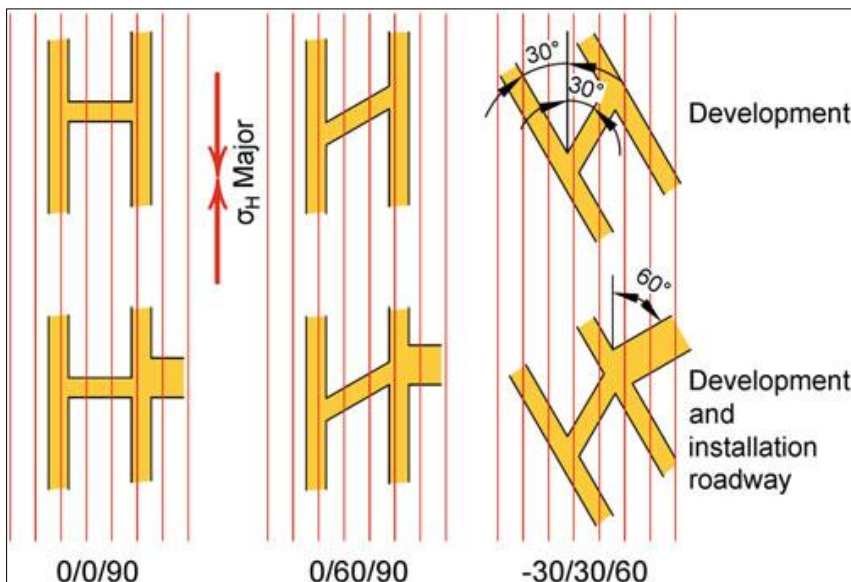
Proposed layout of gateroad by [Galvin \(2016\)](#)
